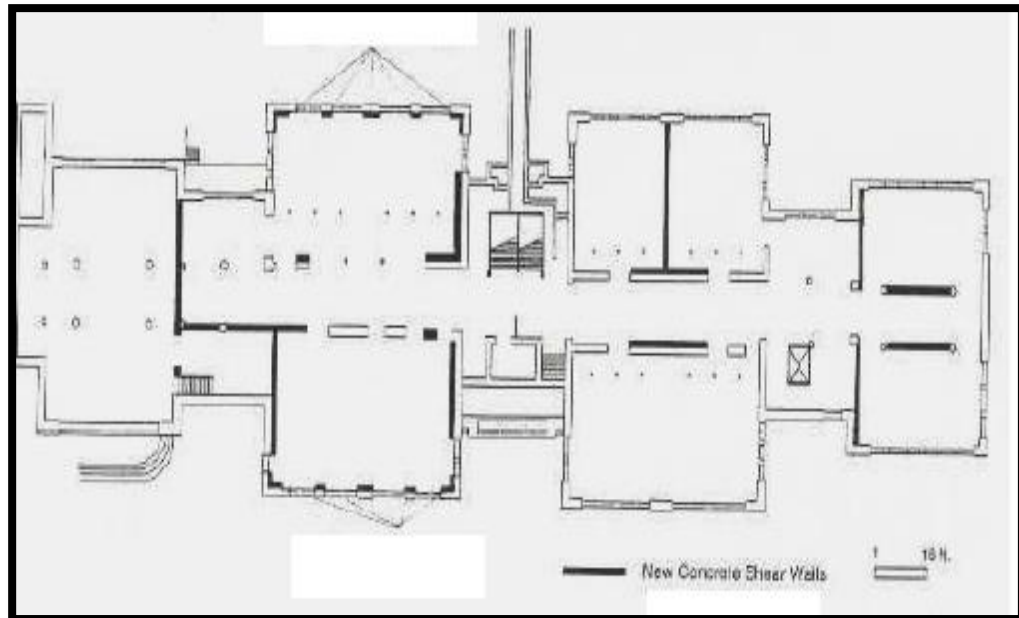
Rehabilitation of a school in Chicago by adding walls to resist earthquakes (Gajanan et al., 1996)
